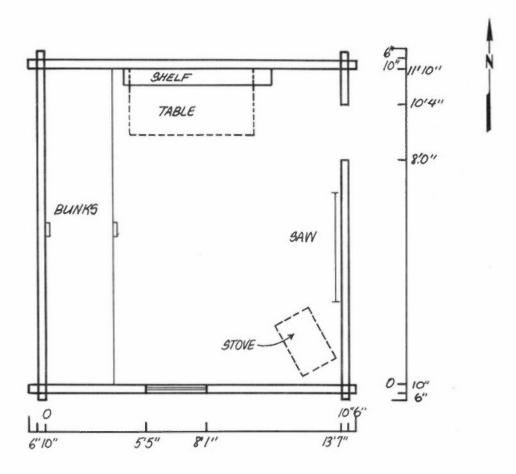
FLOOR PLAN - 40 MILE CABIN
